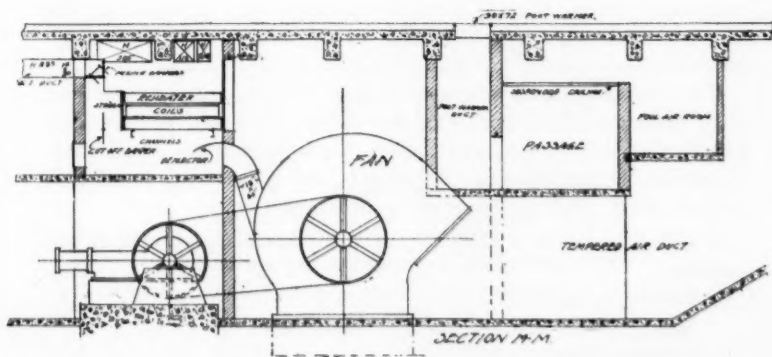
SECTION M-M THROUGH FAN ROOM.
